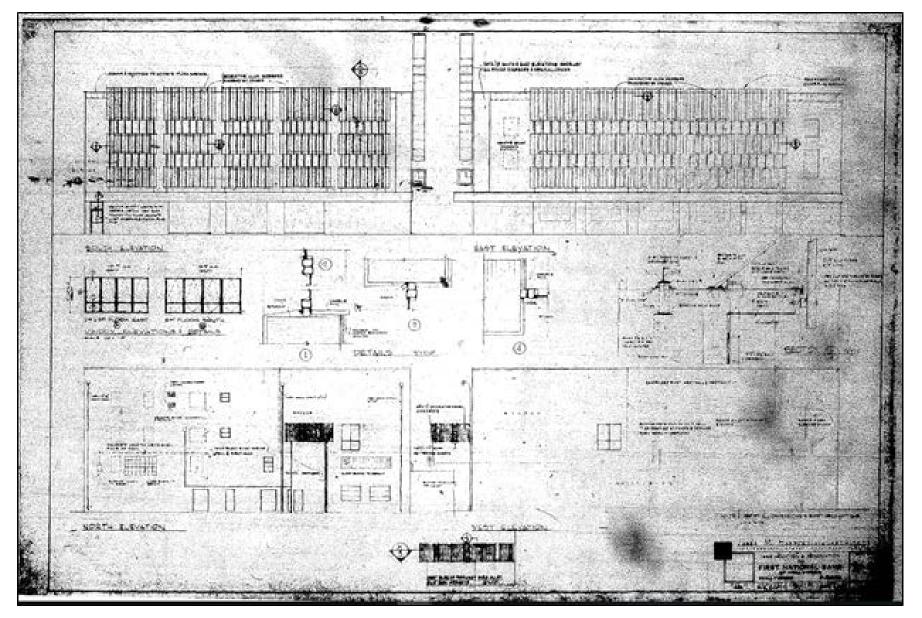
Page from the 1965 Addition and Renovation plans, showing several of the exterior modifications such as the removing and replacement of stucco, addition of screens, and window alterations (City of Hollywood Records and Archives).
